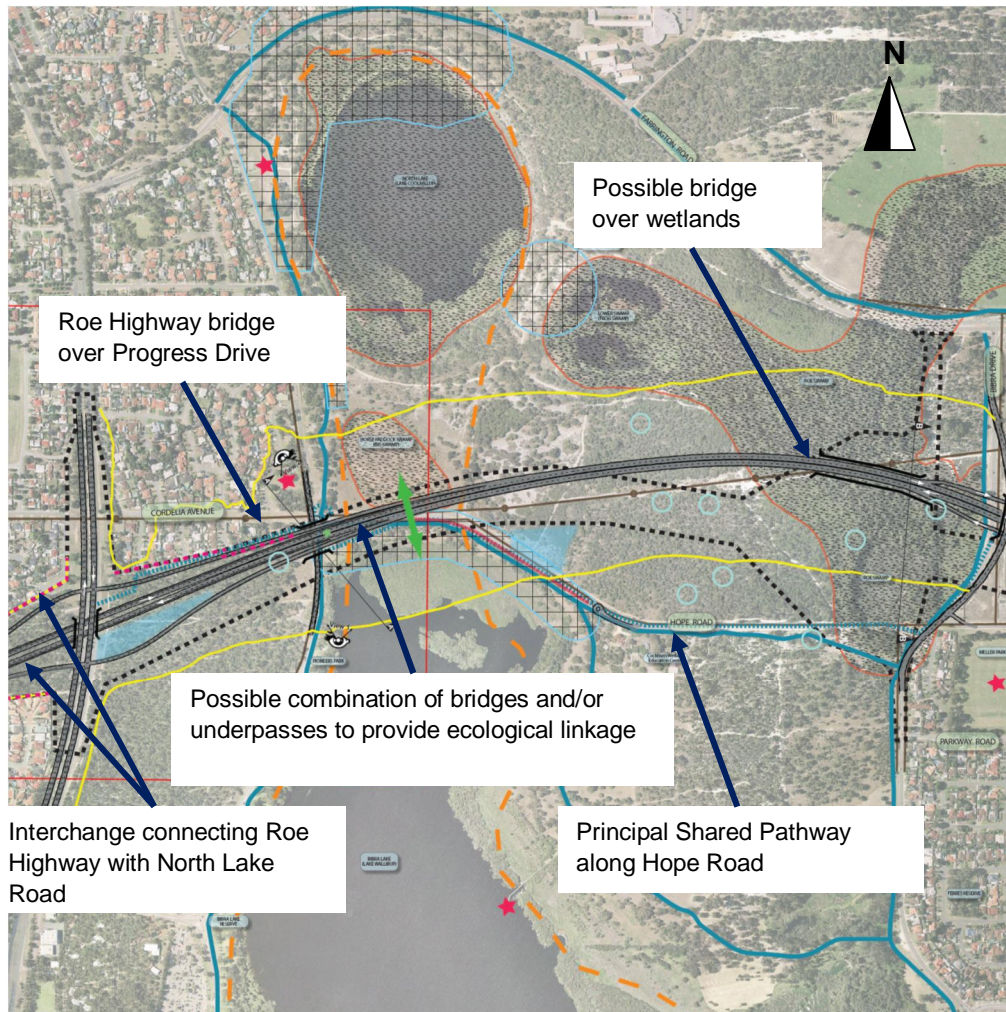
Roe Highway Extension Design Discussion Drawing, Central Section
